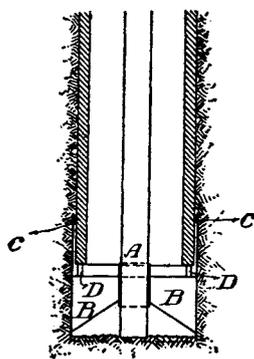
GUIBAL'S MACHINE FOR SINKING SHAFTS IN RUNNING SAND.
